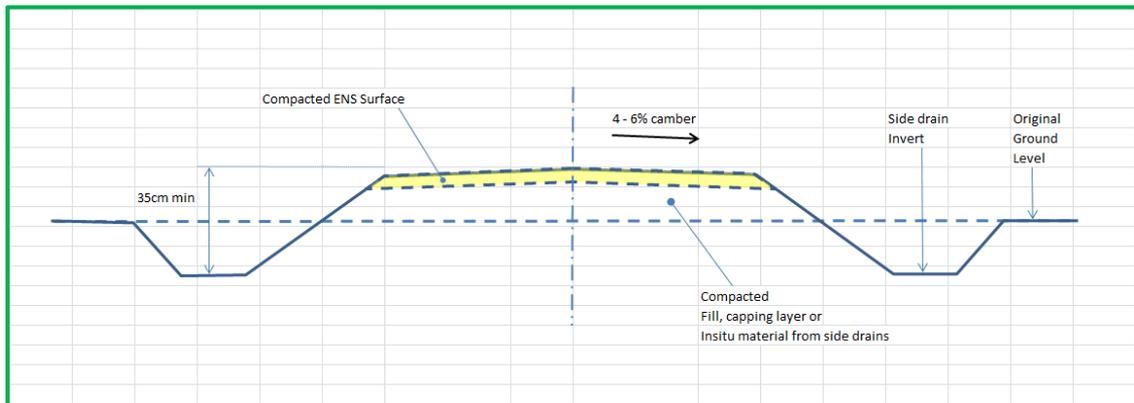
Typical Engineered Natural Surface road cross section in flat terrain
